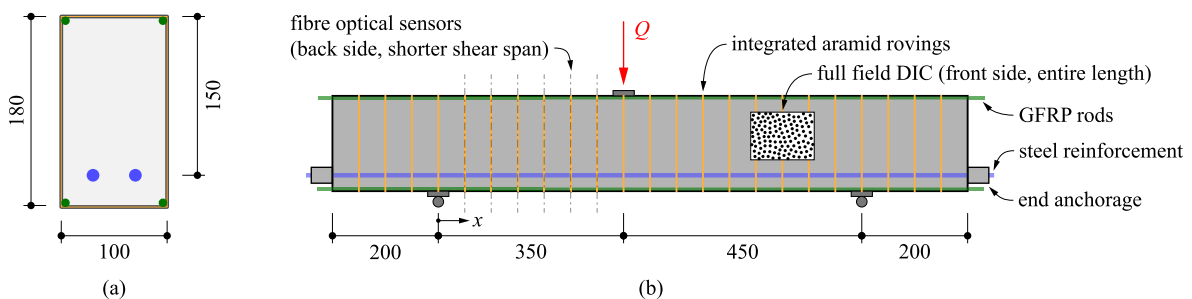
Specimen configuration: (a) cross-section dimensions, (b) test setup and instrumentation (dimensions in [mm]).
